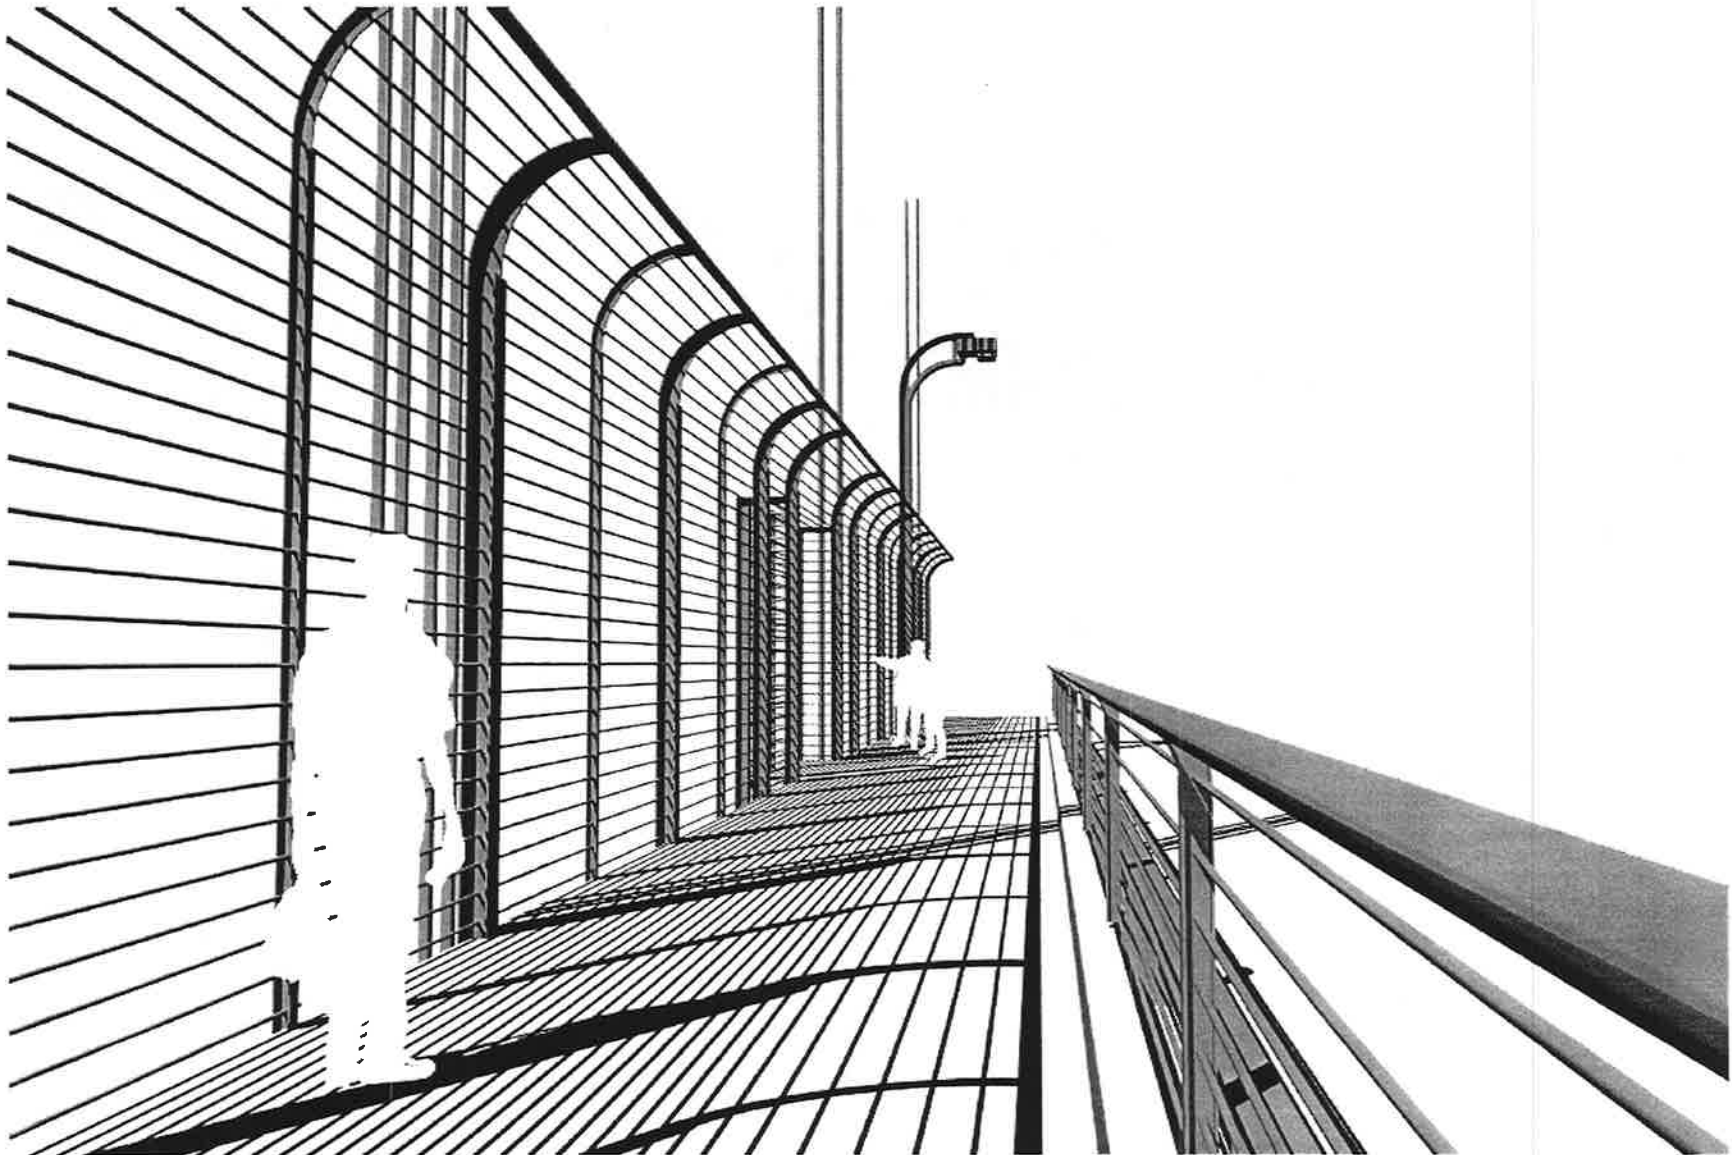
EXAMPLE OF CONCEPT 2 (EXAMPLE SHOWN WITH HEIGHT OF 14'-0", NO VISIBLE WINGLET; 50" UNDER DECK WINGLET ON EAST SIDE AND 48" CATWALK ON WEST SIDE, CURVED TOP, HORIZONTAL CABLE MEMBERS SPACED AT 6", SOLID RATIO OF 16%) *VIEW FROM SIDEWALK
